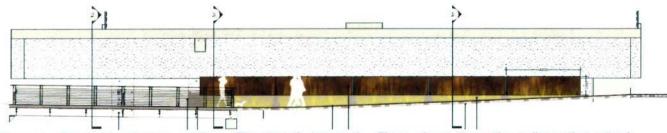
Proposed underpass design – Elevation (facing east). Figure shows the entire walkway that extends underneath the bridge deck, between the waterfront plaza (right in Figure 1) along the top of the rip-rap slope, in front of the main bridge vertical structural members.
